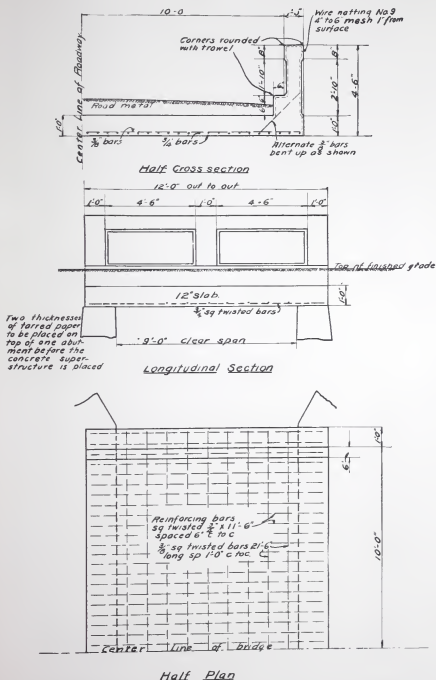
Standard concrete bridge of 9-foot span and 20-foot roadway. Designed by the Ohio State Highway Department. (Class "C" loading.)
